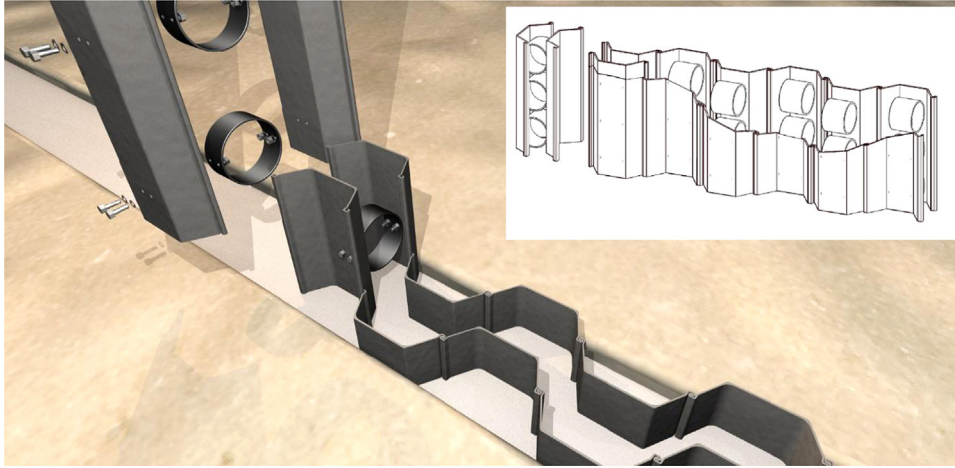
Conceived construction process: the panels are assembled from conventional sheet-pile walls and circular hollow sections (sacrificial fuses) before being lowered into the bentonite supported excavation pit.
